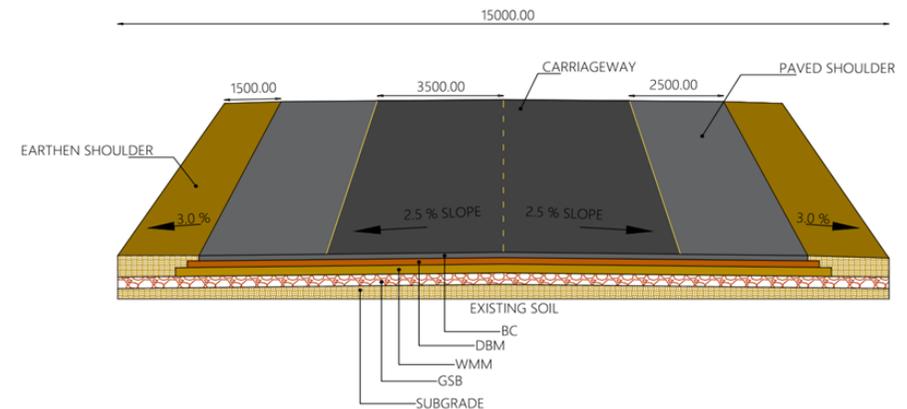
Typical Cross Section of 2 Lane Pavement with Conventional GSB
